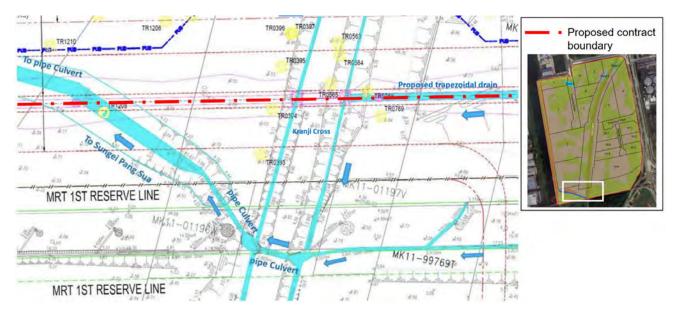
Proposed layout of trapezoidal drain and its connection to the unlined earth drain on the east of Kranji Cross (Source: CPG)
